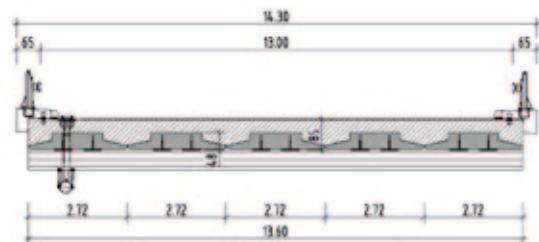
, Cross section of frame bridge WD-4 with prefabricated elements
